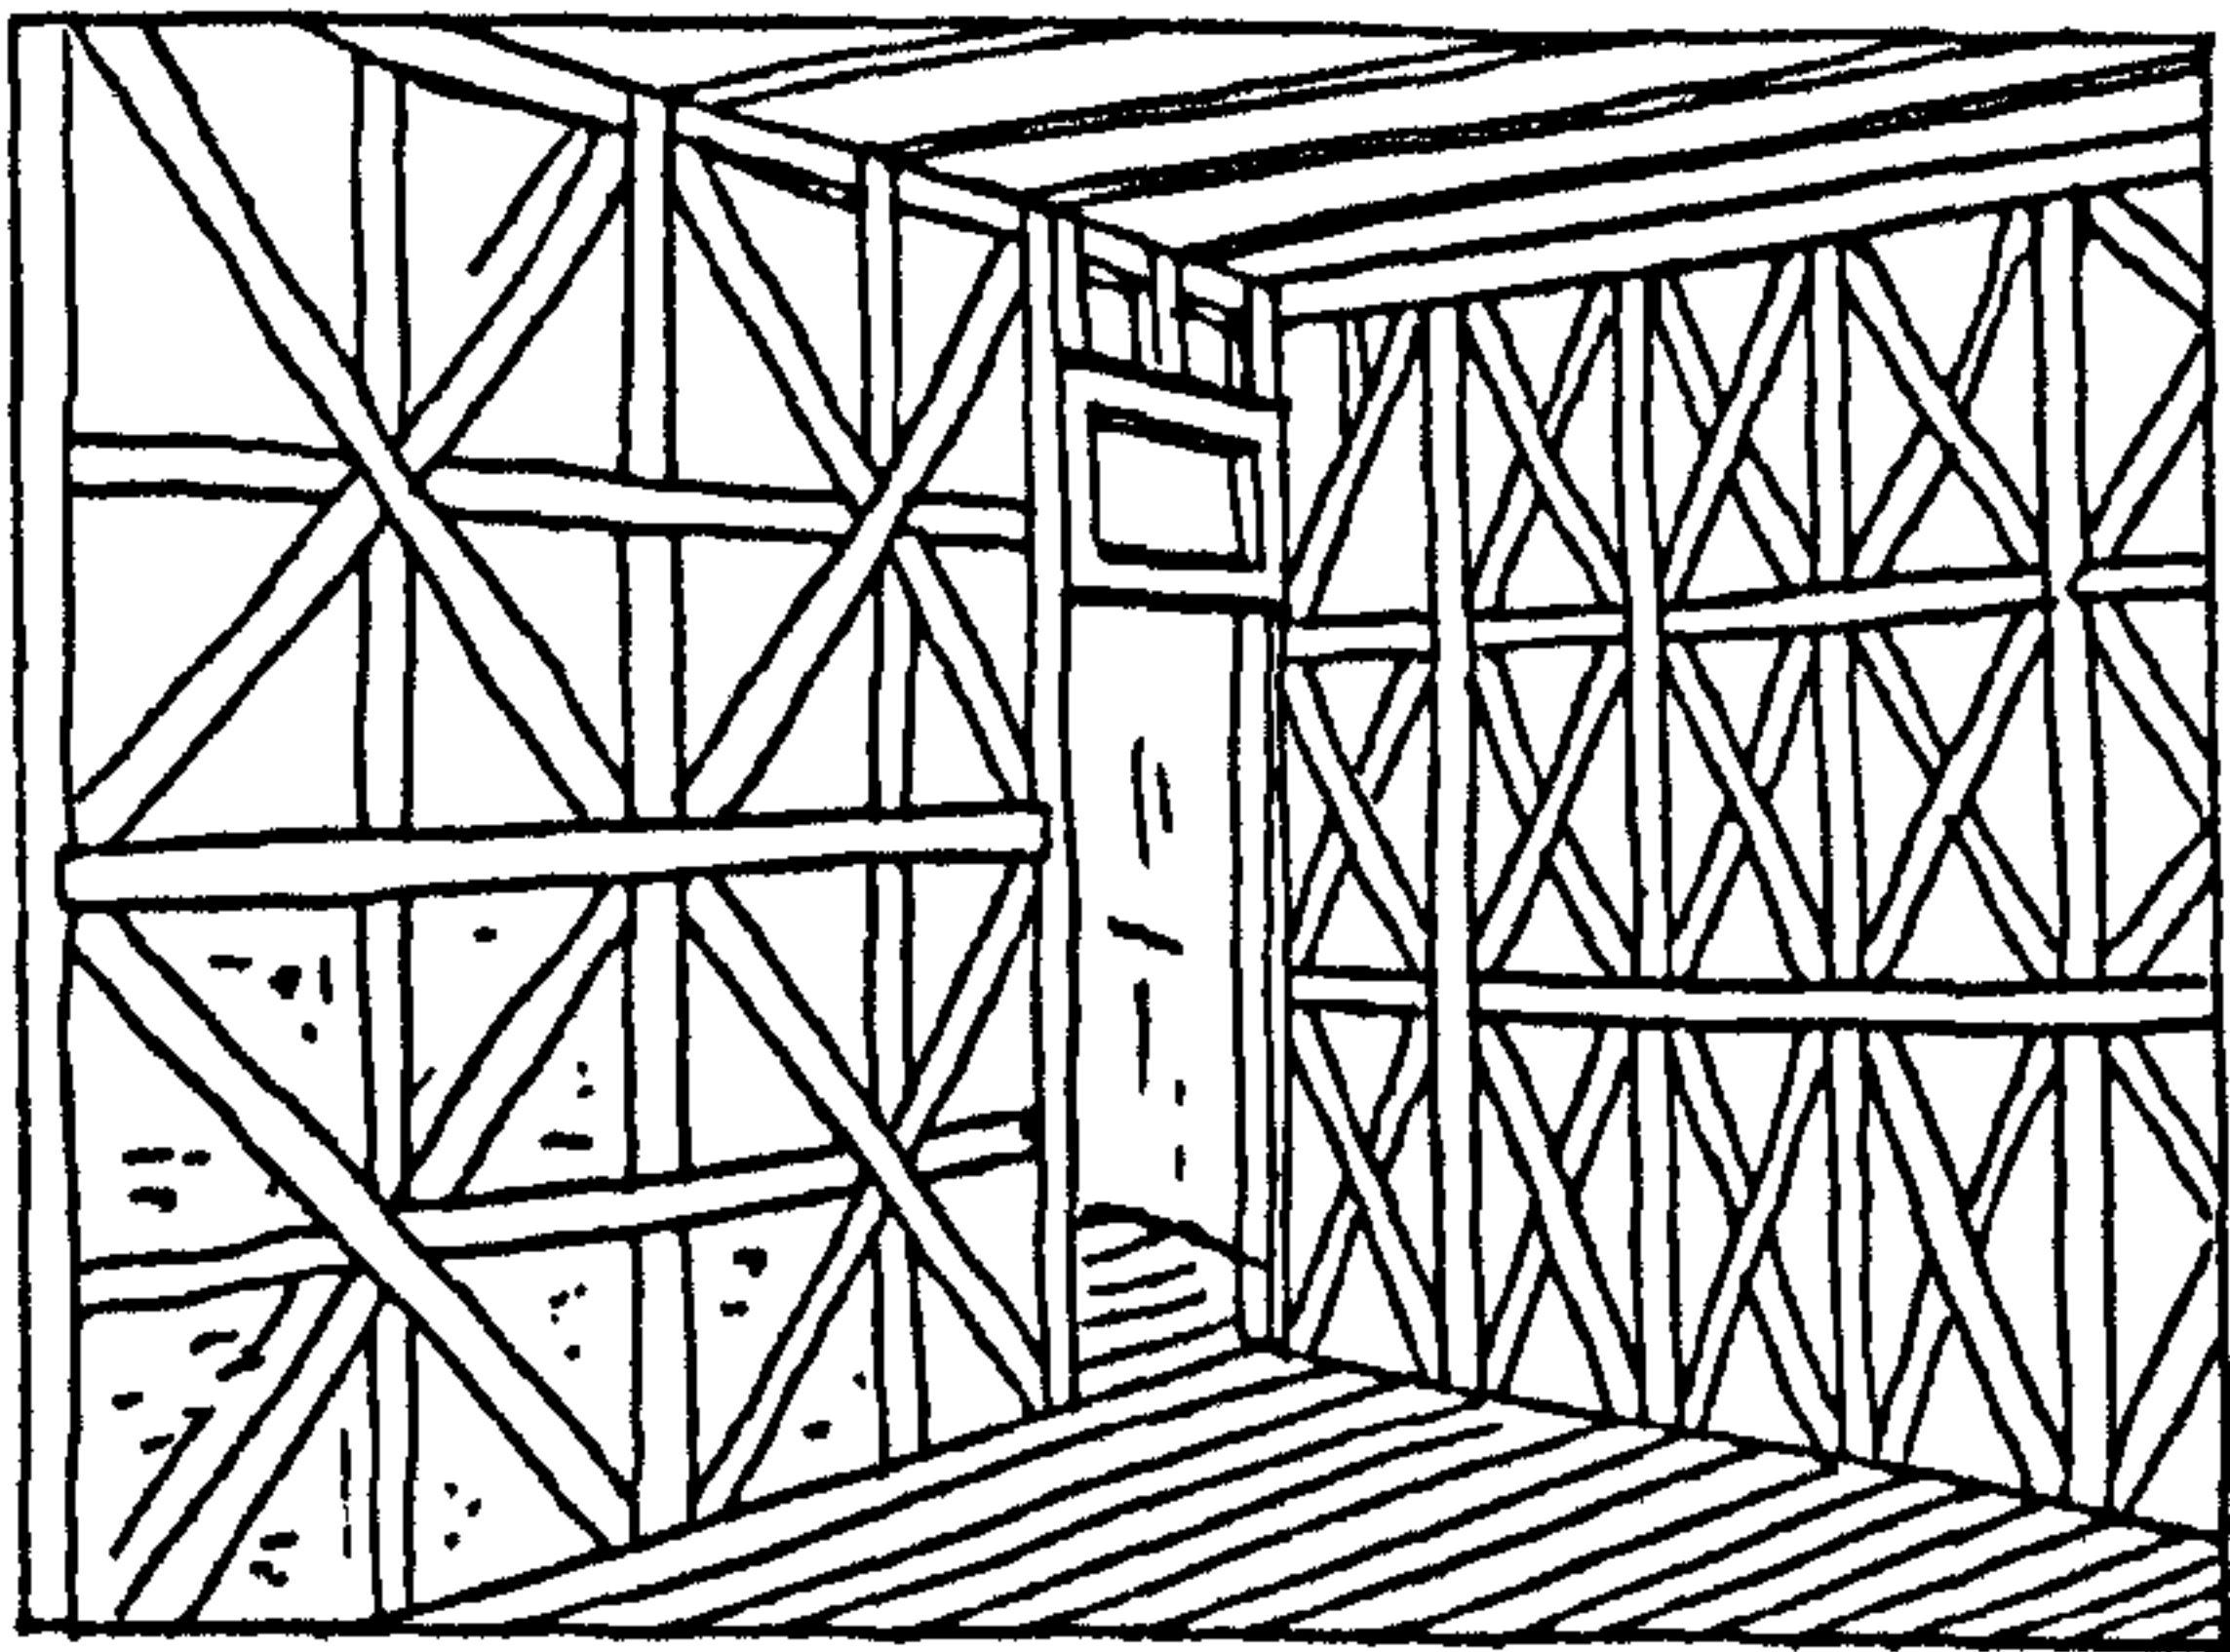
The left panel has been reinforced with horizontal elements because behind is supporting a stair.
